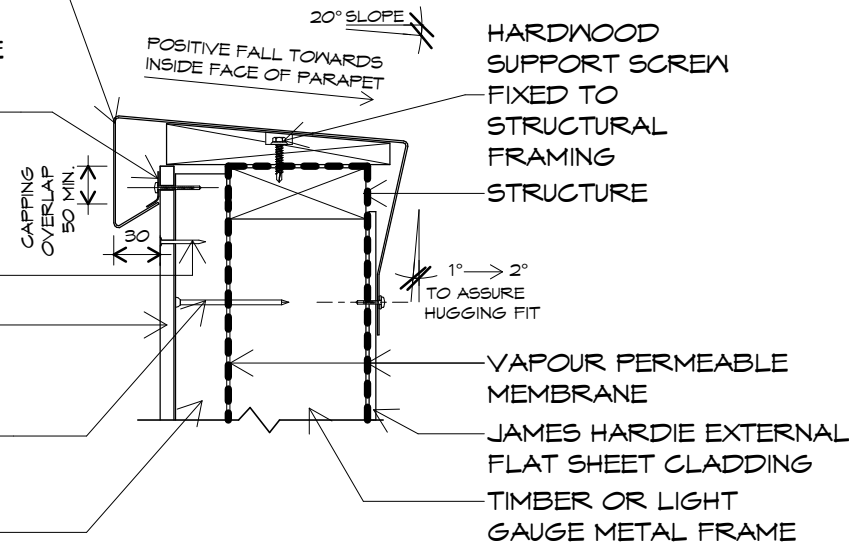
EXTERNAL VERTICAL CLADDING - PARAPET CAPPING ON BATTENS NTS
